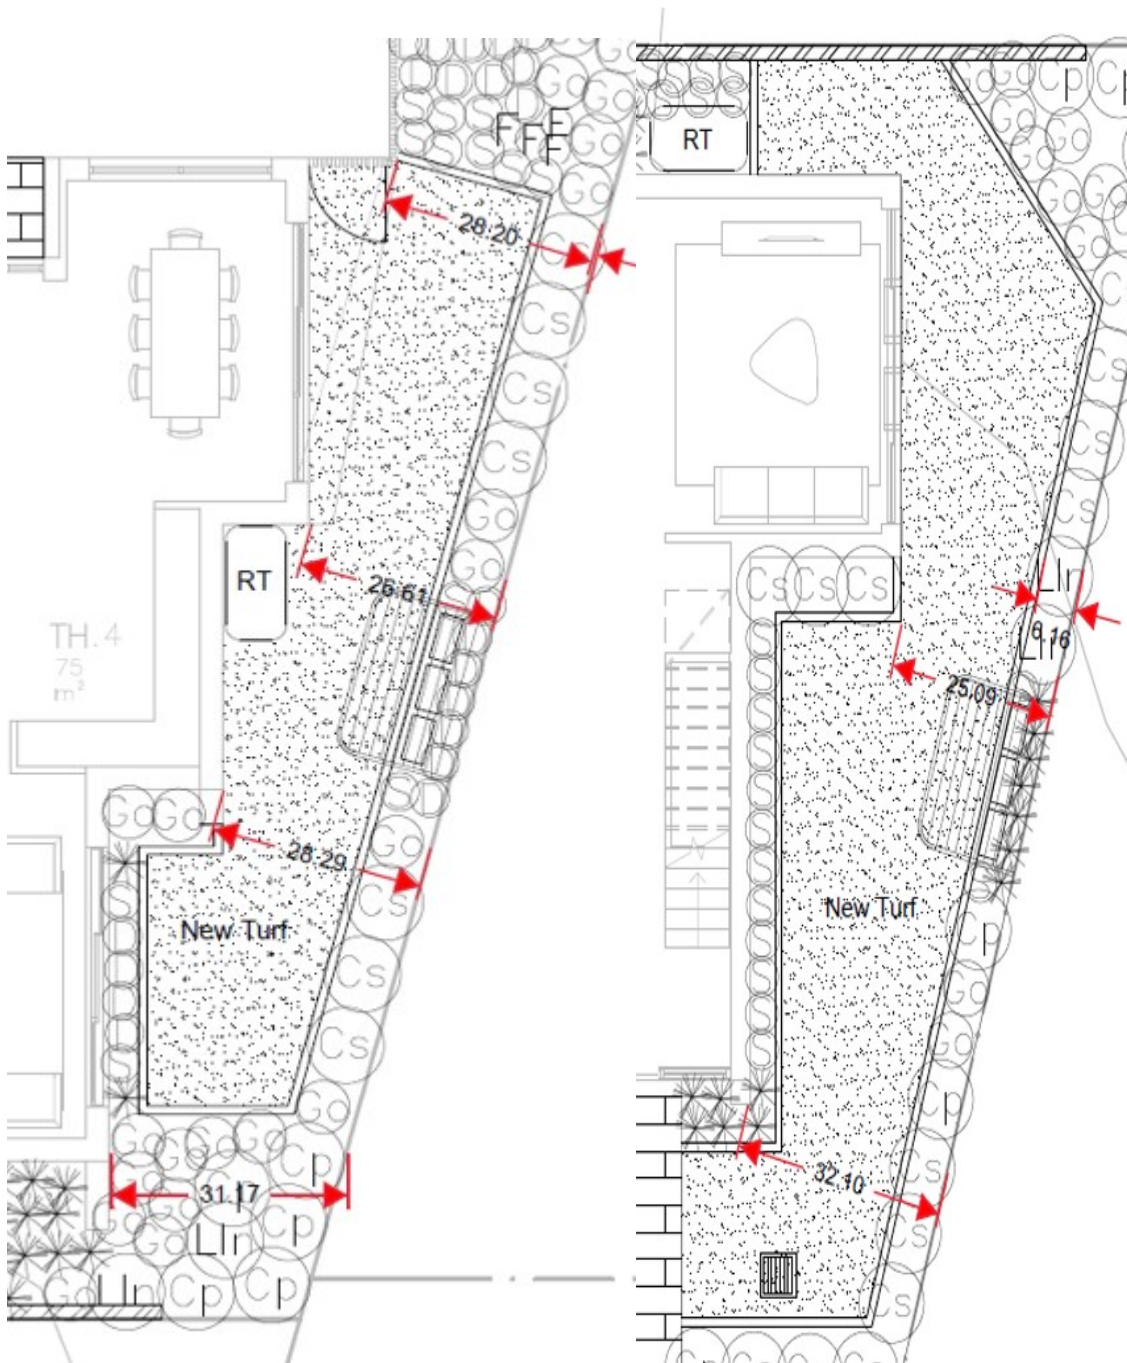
Extract from rear planting plan indicating rear boundary offsets and garden width.
